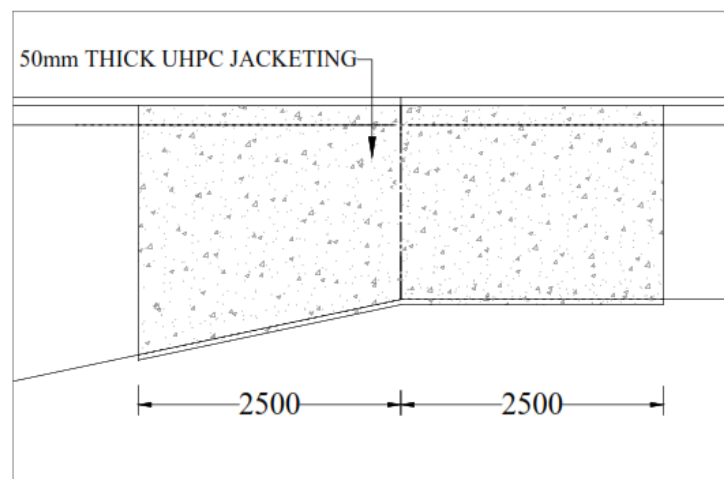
Detail of UHPC strengthening where cross section/geometry of box girder is changing in continuous span.
